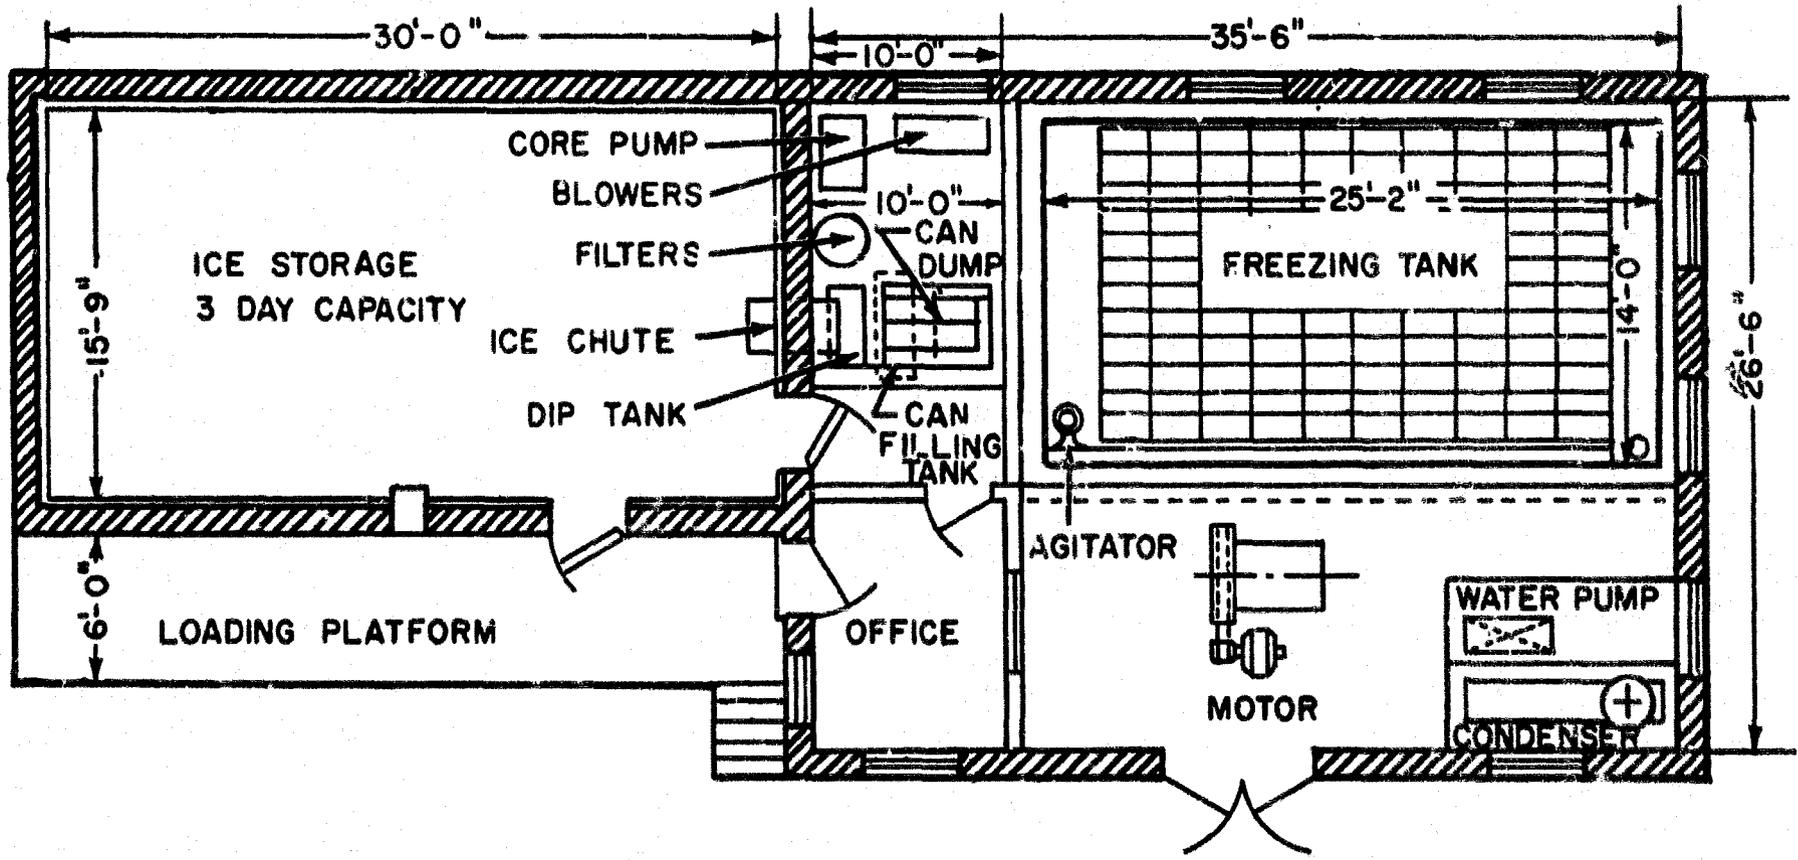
Plan View of a Typical 10-Ton Ice Plant
